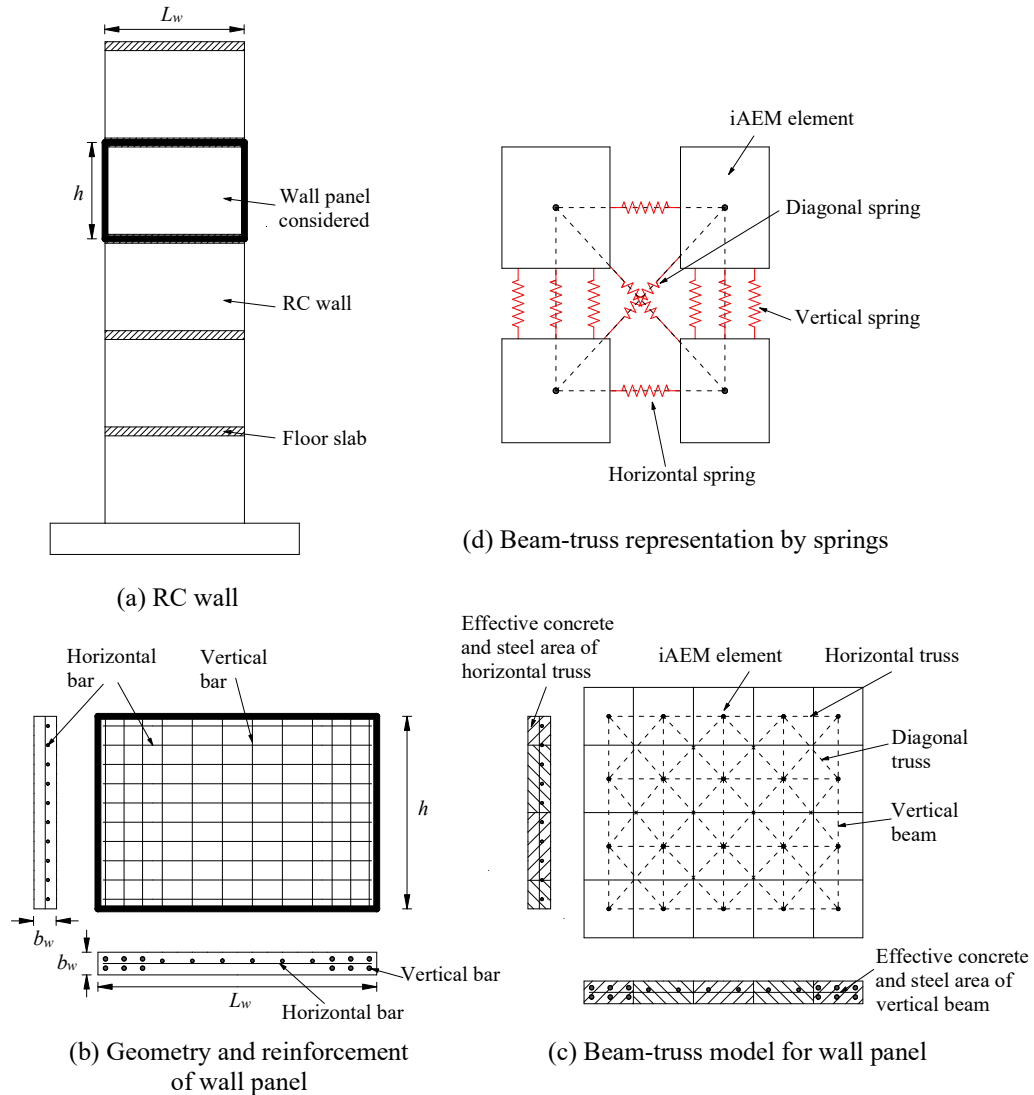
RC shear wall and beam-truss model for wall panel using iAEM
